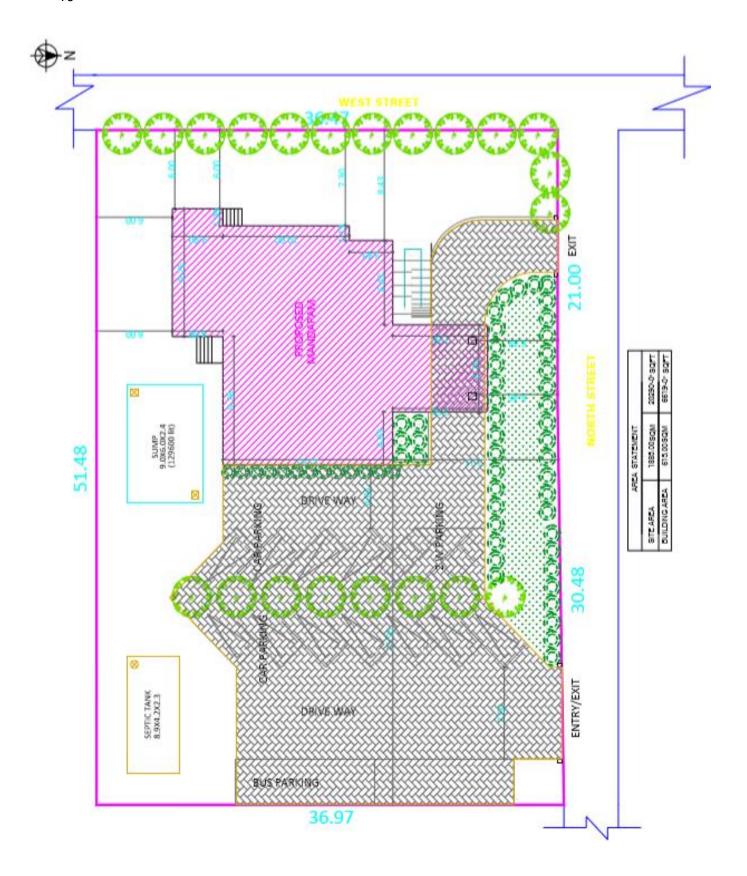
(b) Proposed site plan for subproject components - Vedaranyam
